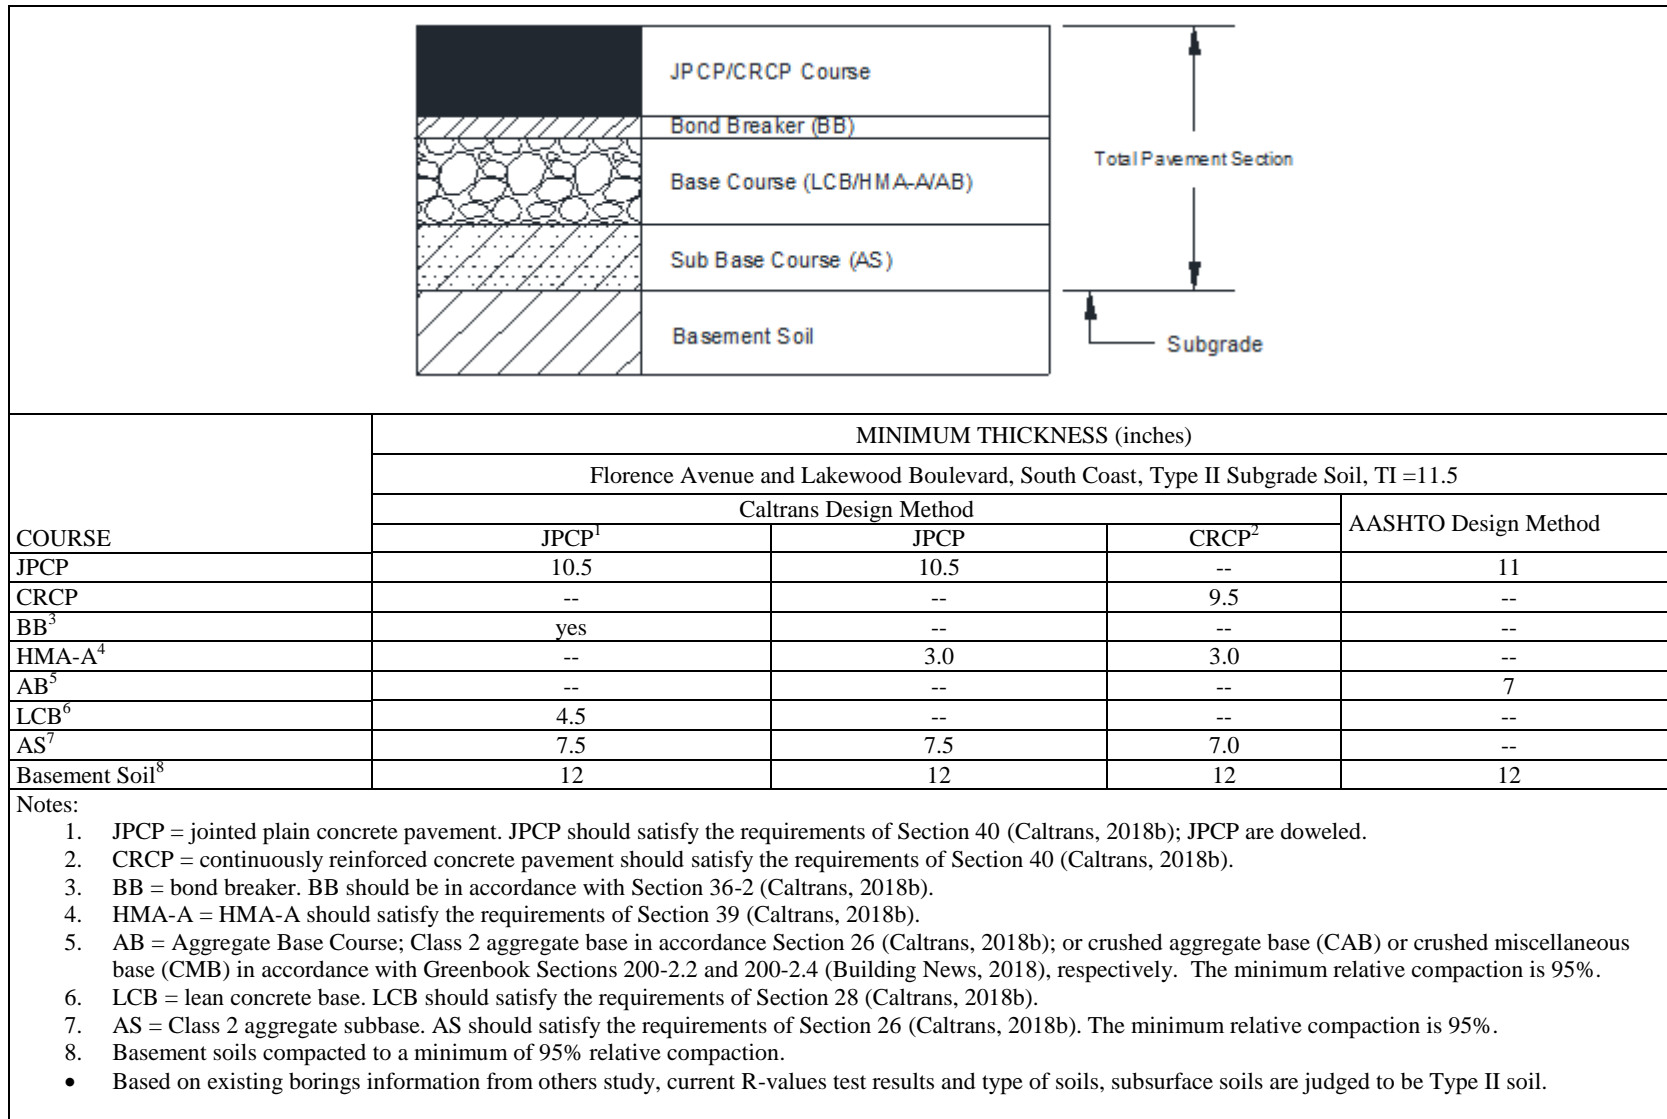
NEW RIGID PAVEMENT STRCUTURAL SECTION
